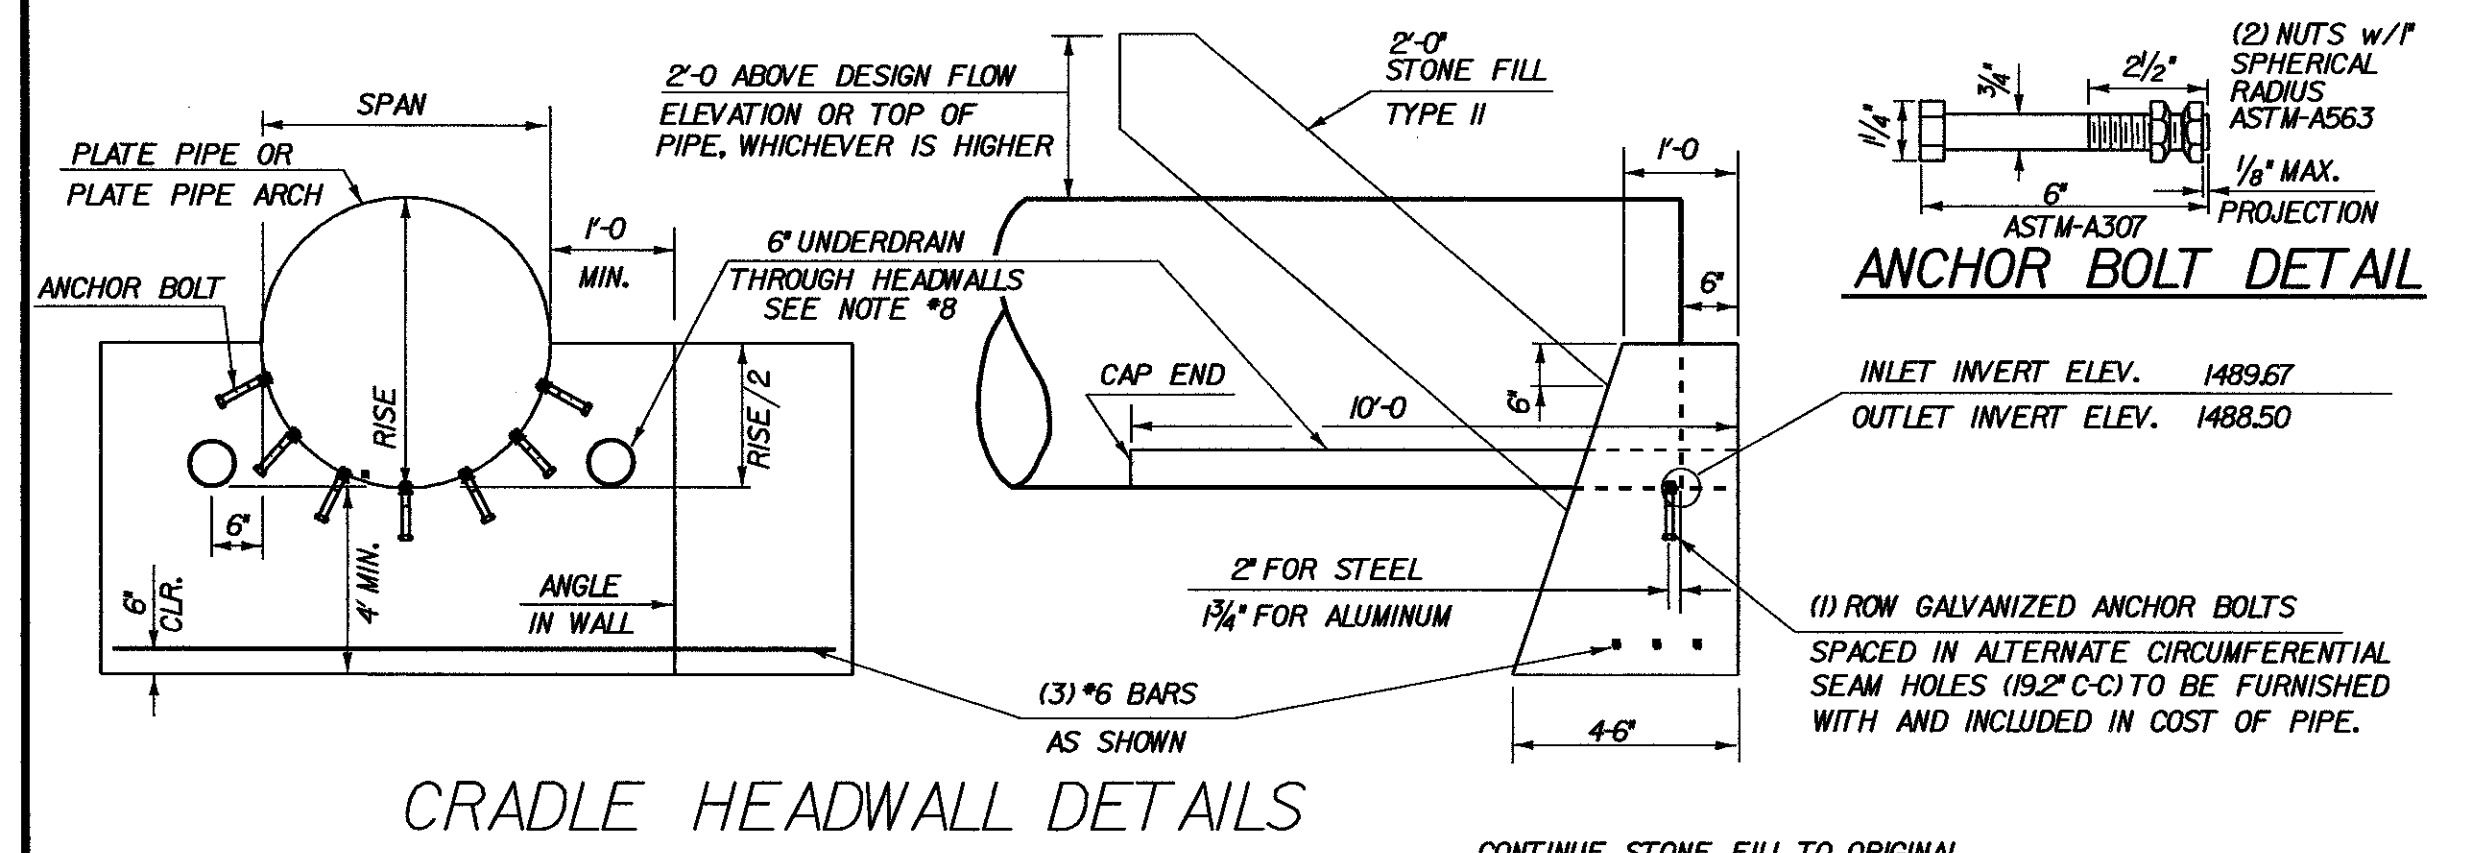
DETAILS OF STRUCTURAL PLATE PIPE CULVERTS
